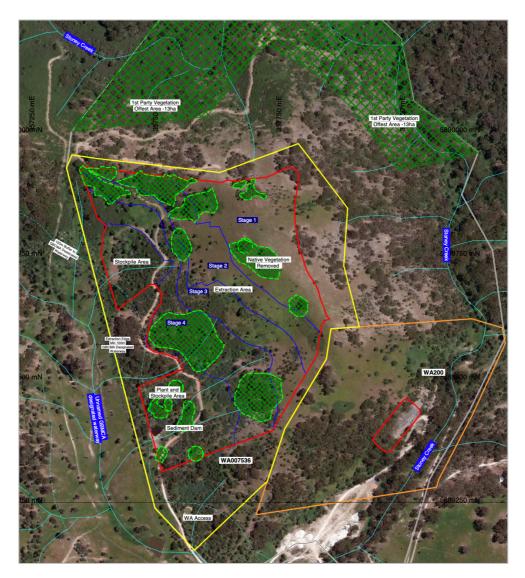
Excerpt of Site Layout Plan (source: Figure 3 of the Endorsed Work Plan)
